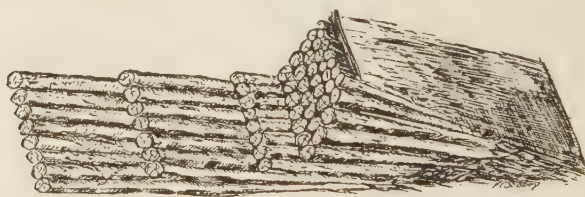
Sketch showing manner of placing logs in a typical log dam.
